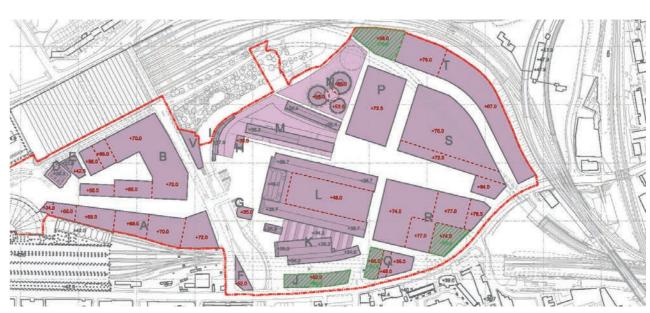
Parameter Plan KXC 014 - Maximum Building Heights
